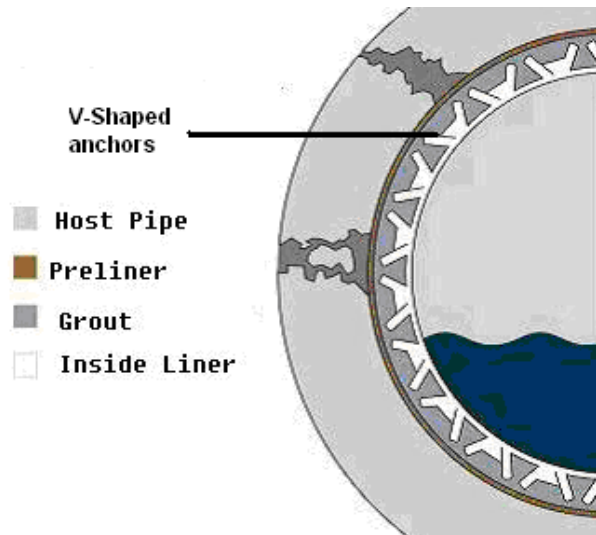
Formed-in-Place Pipe cross section (ASCE, 2008).
